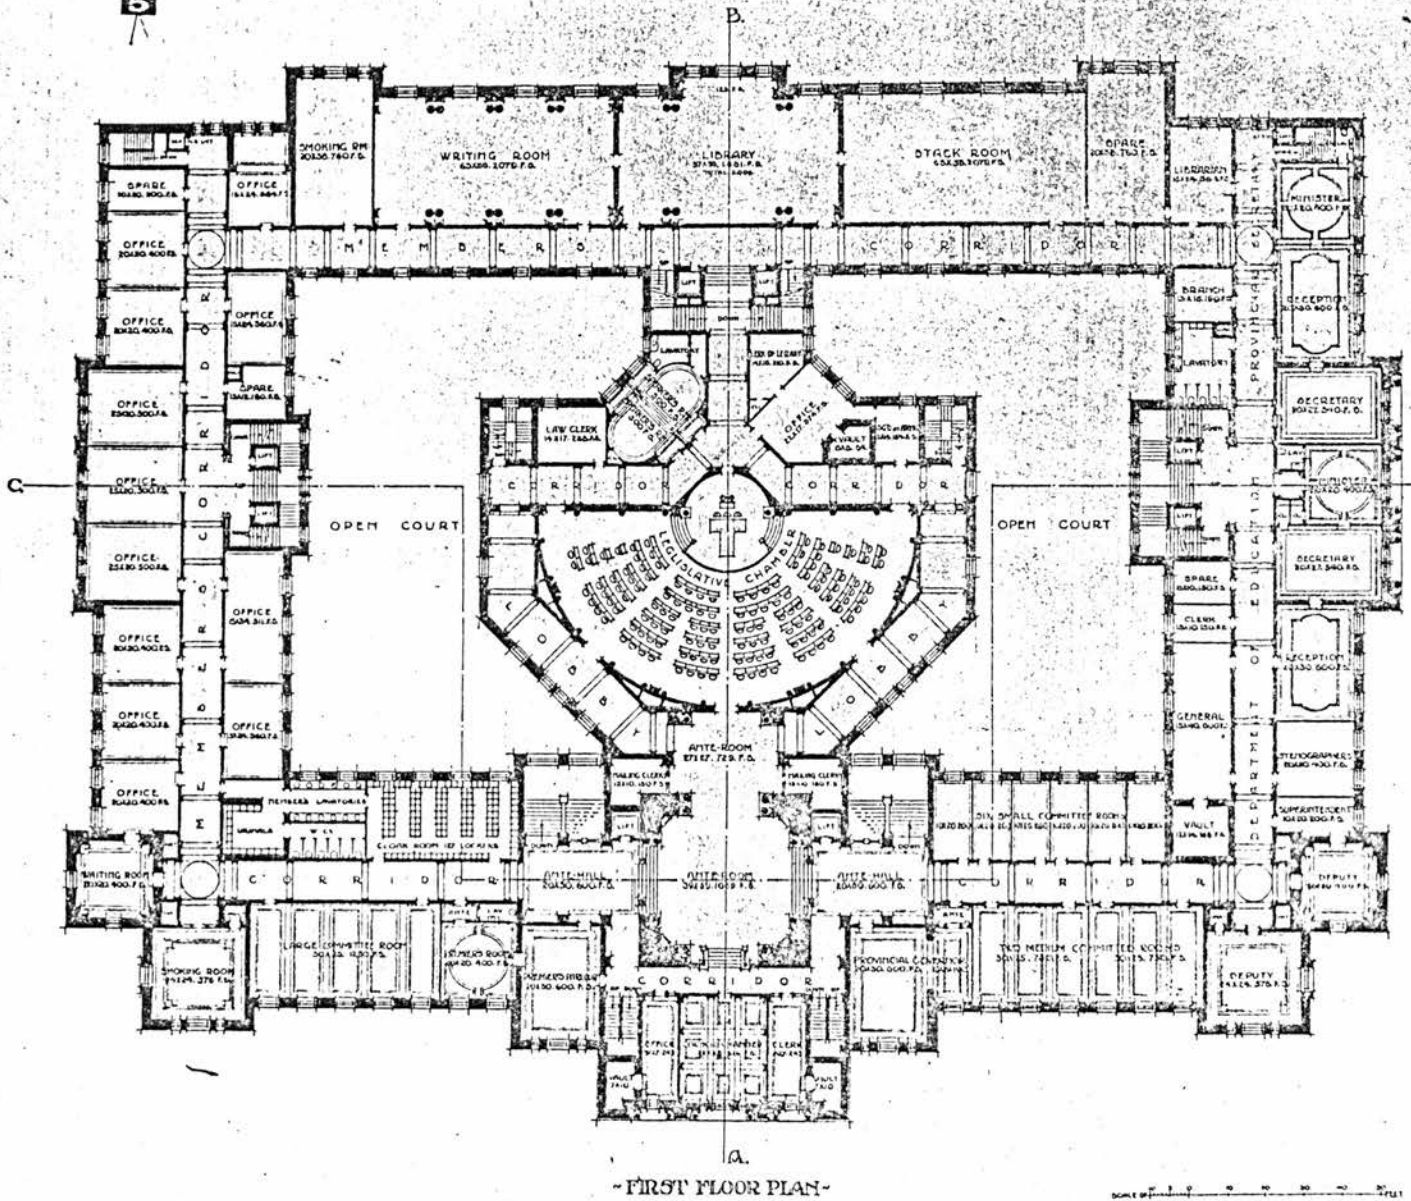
, Design for proposed Legislative Building, Regina, Saskatchewan, first floor plan, Mitchell and Raine, architects, (1907).
